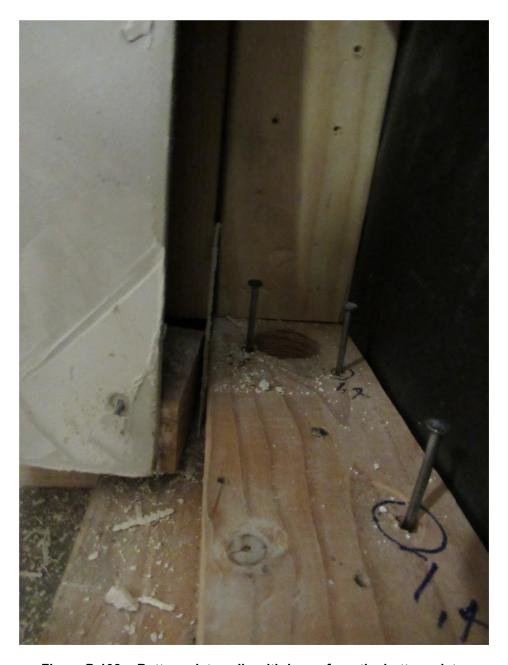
Bottom plate nails withdrawn from the bottom plate.
